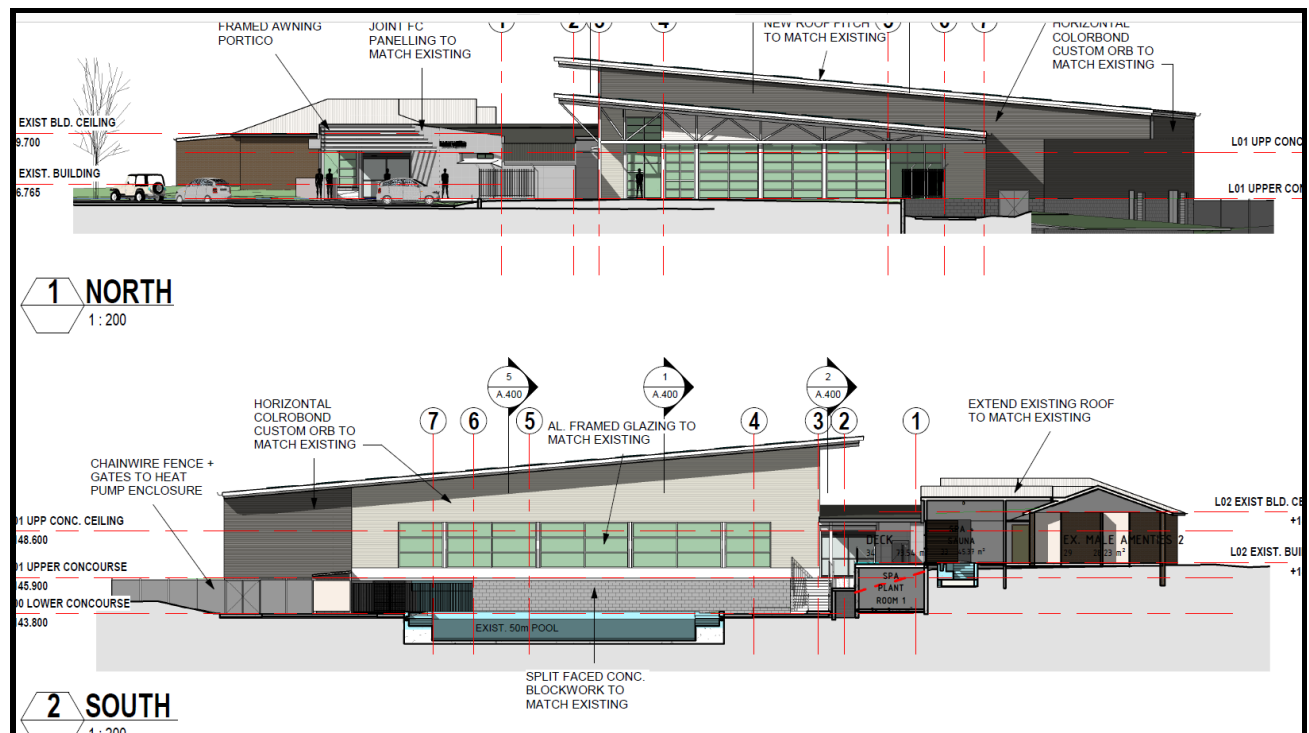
Proposed North and South Elevations (Source: Facility Design Group dated 22/1/2019)
